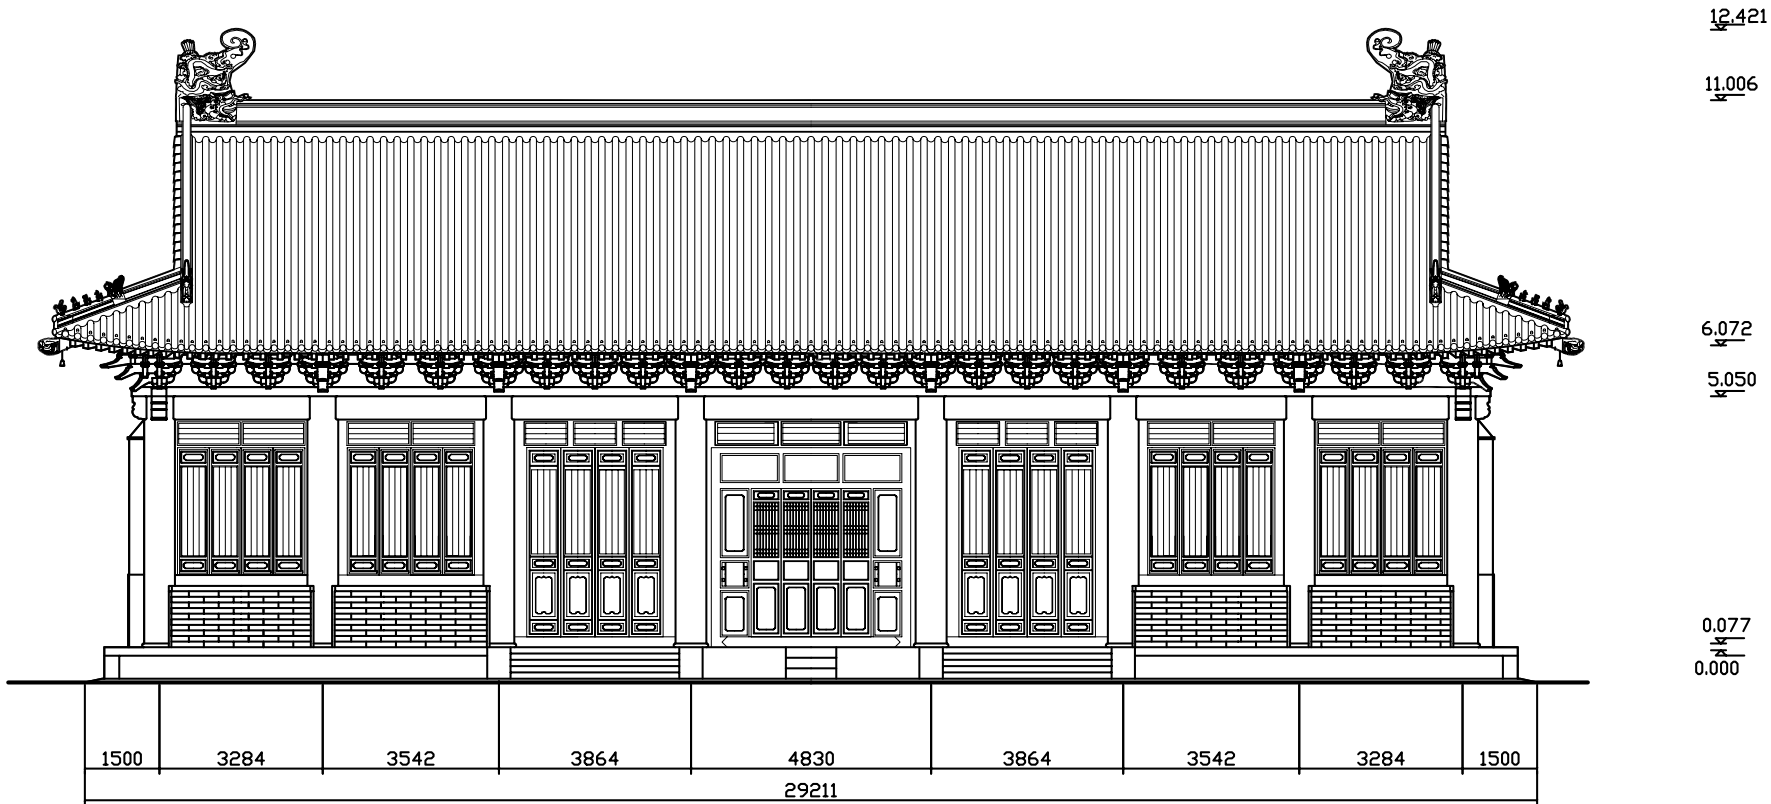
J-8 Inside elevation of Junji Hall of Zhongyue Temple
